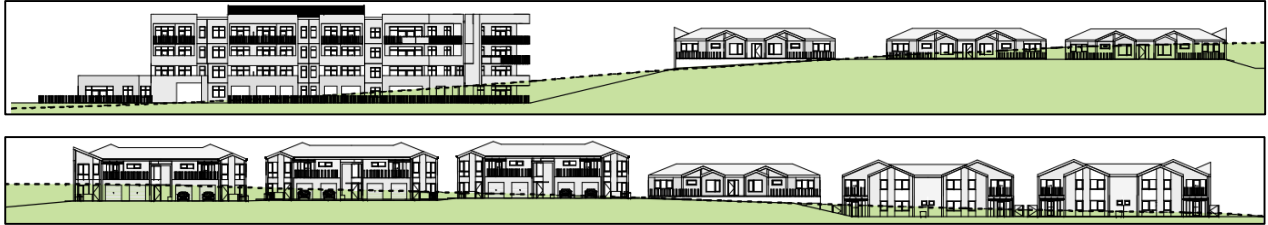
Manchester Road (east) elevations (split halfway south to north) (see Attachment 4 Plans TP013)
